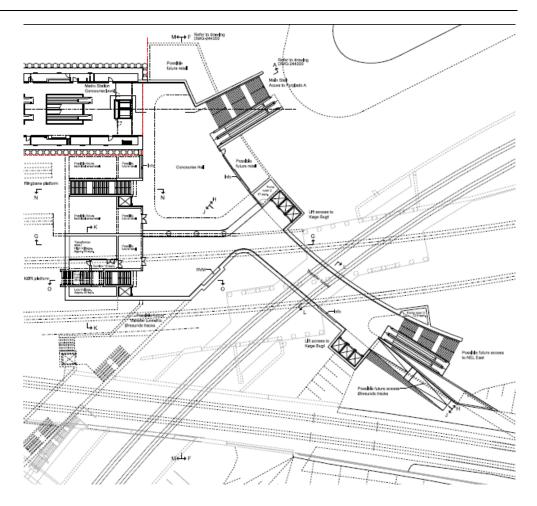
Ny Ellebjerg station, Plan showing layout of station, concourse hall, main stair and transfer tunnel.
